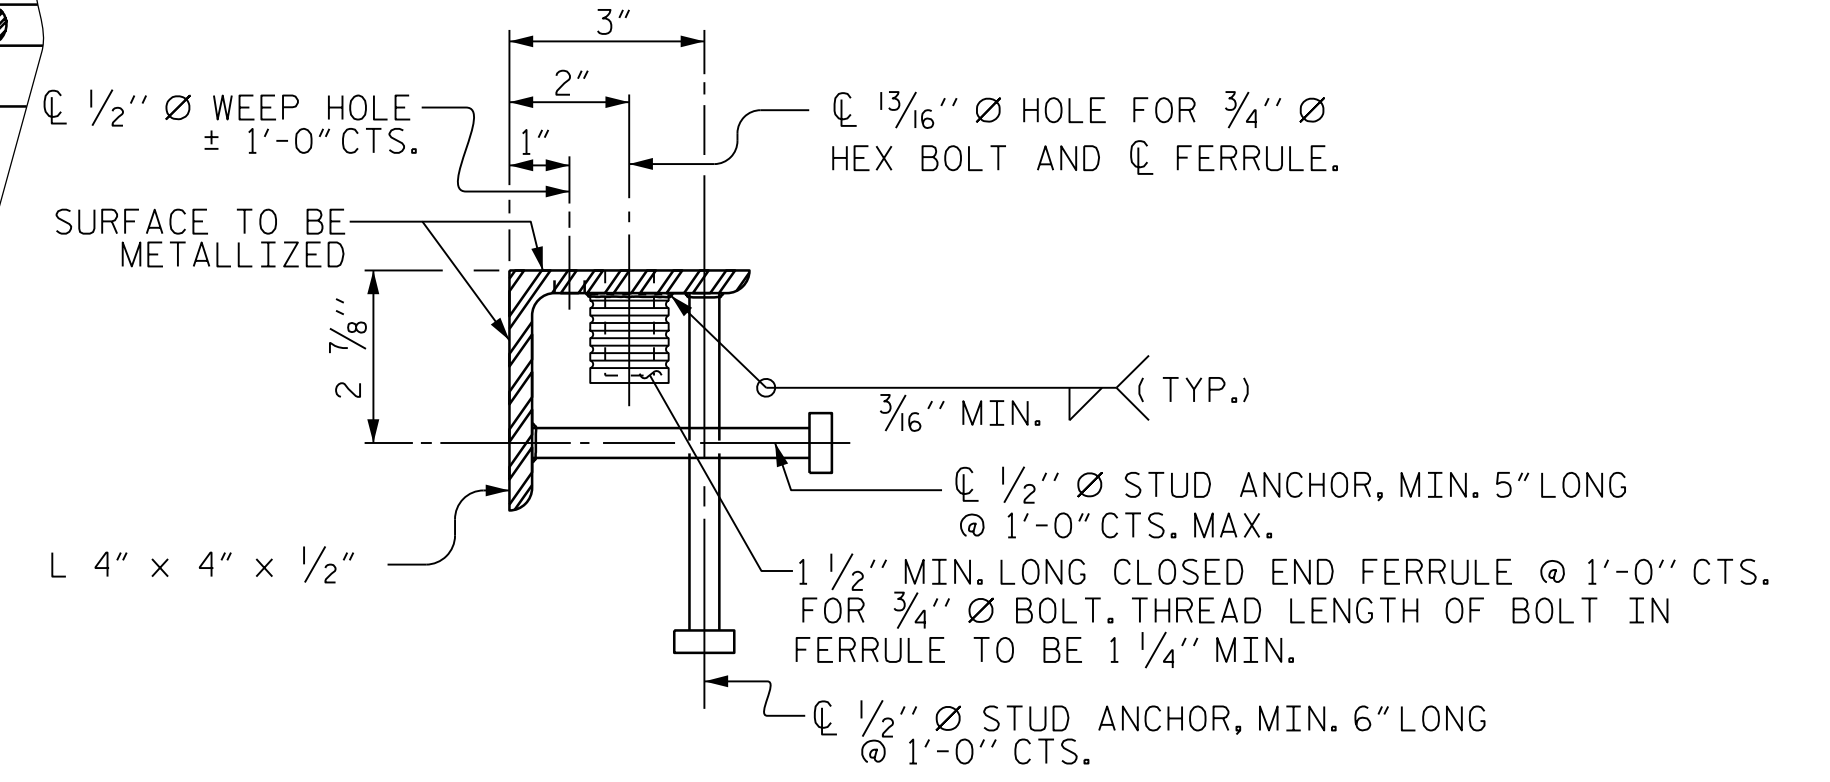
DETAIL - FIELD WELD SPLICE OF BASE ANGLE
